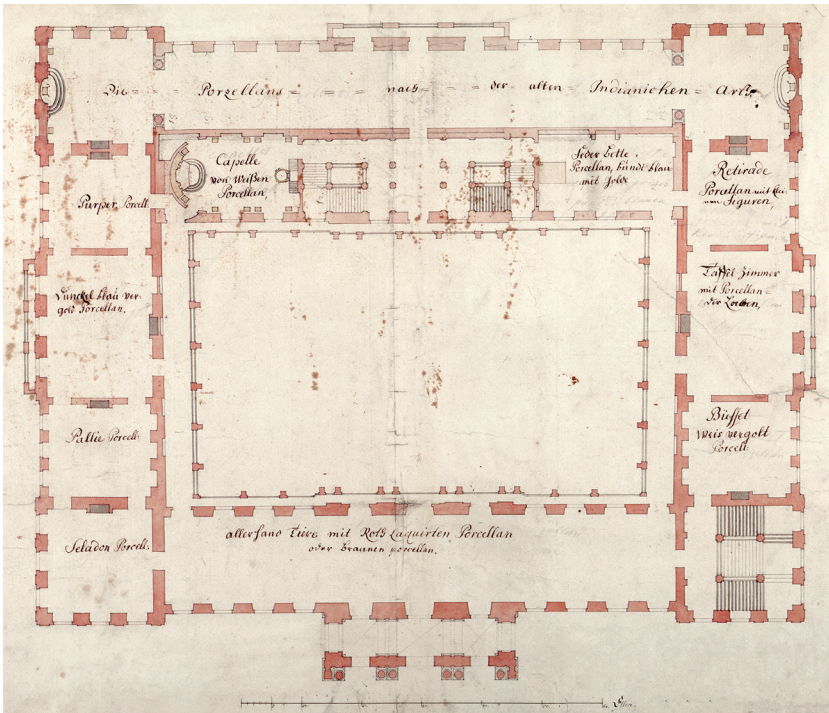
Japanese Palace, floor plan of the upper floor, 1730.
